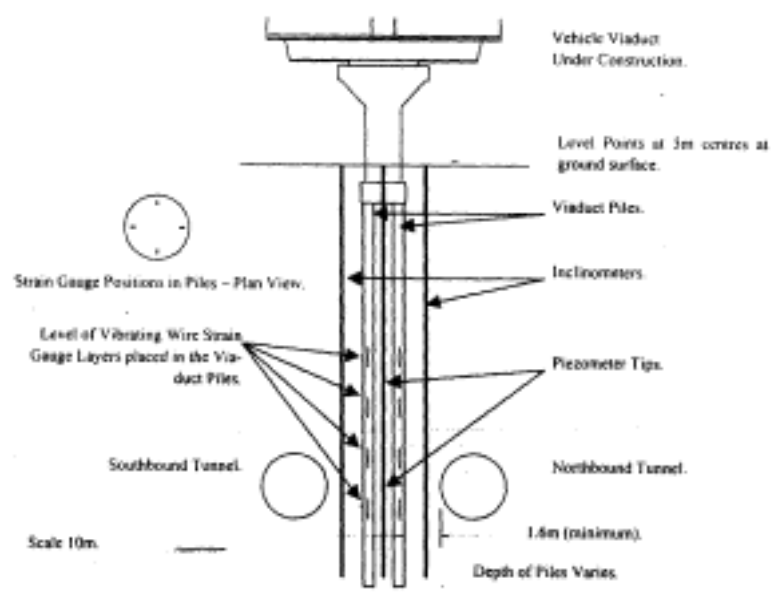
Viaduct, pile and tunnel layout (Coutts and Wang, 2000)
